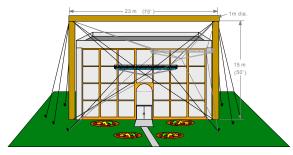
Graphic of a model Flying Carpet applied to external building surface access.
